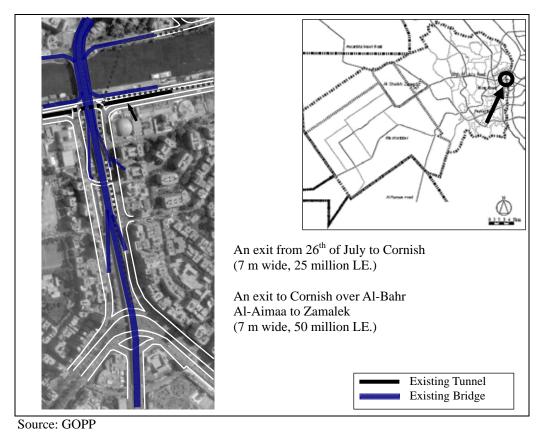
Improvement of 15th of May Bridge (Alternative 2)
